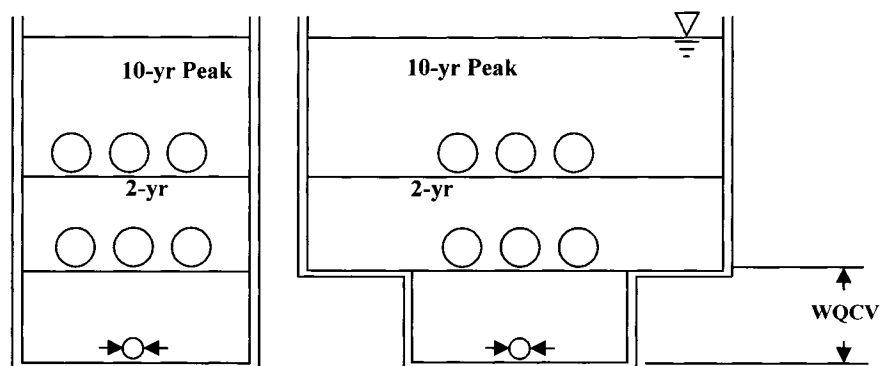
General Design of Stormwater Detention Pond Outlets.
